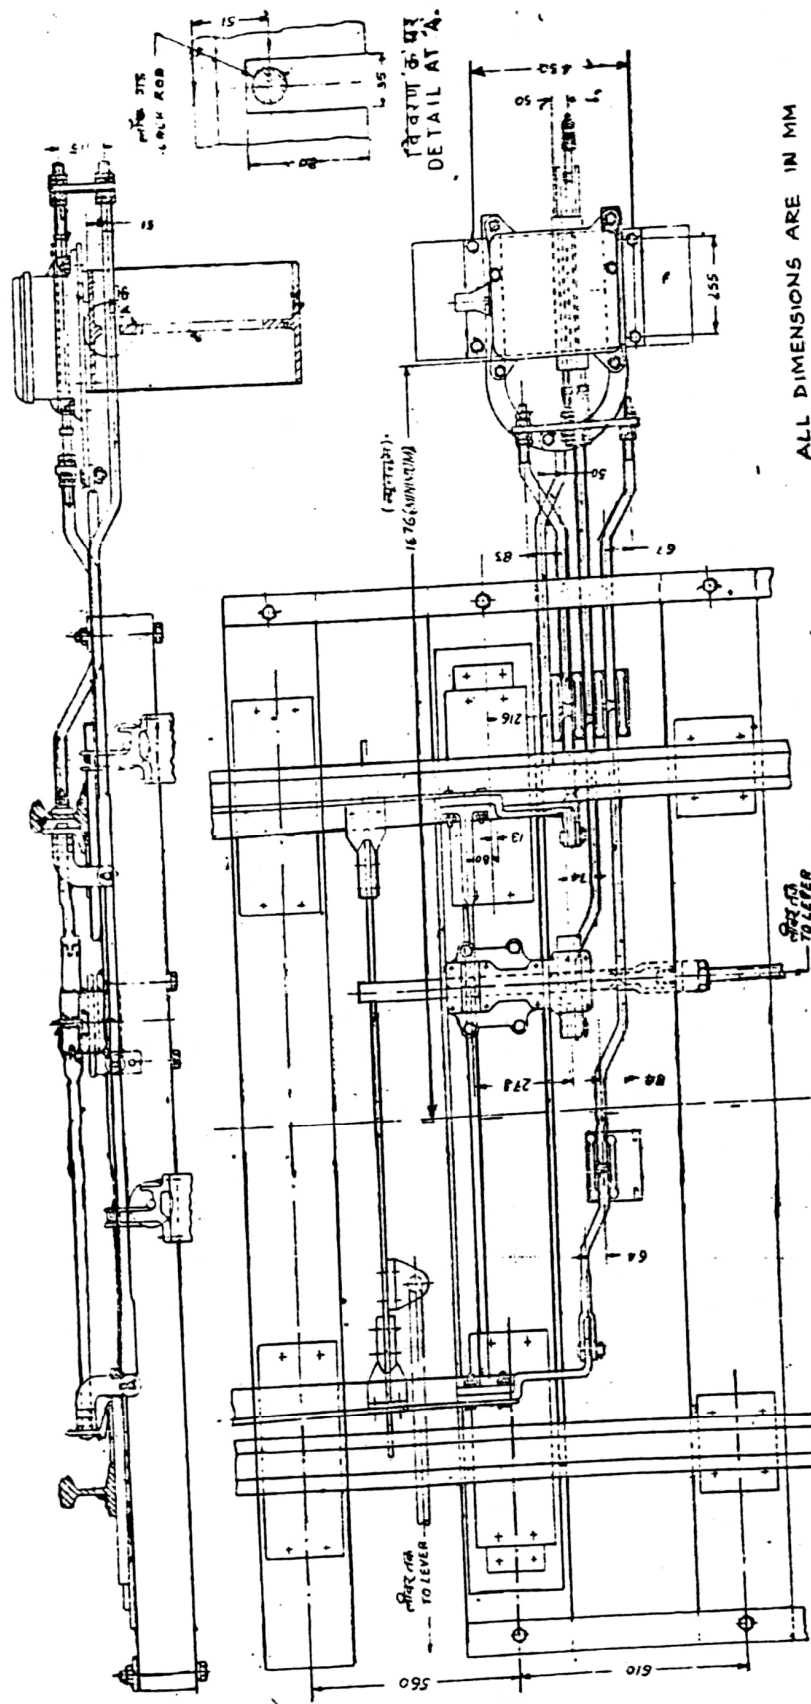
FIXING ARRANGEMENT OF ELETRIC FACING POINT AND LOCK DETECTOR ON INDEPENDENT FOUNDATION (LAYOUT FOR 75R OR 1 IN 12 TURNOUT BG)
